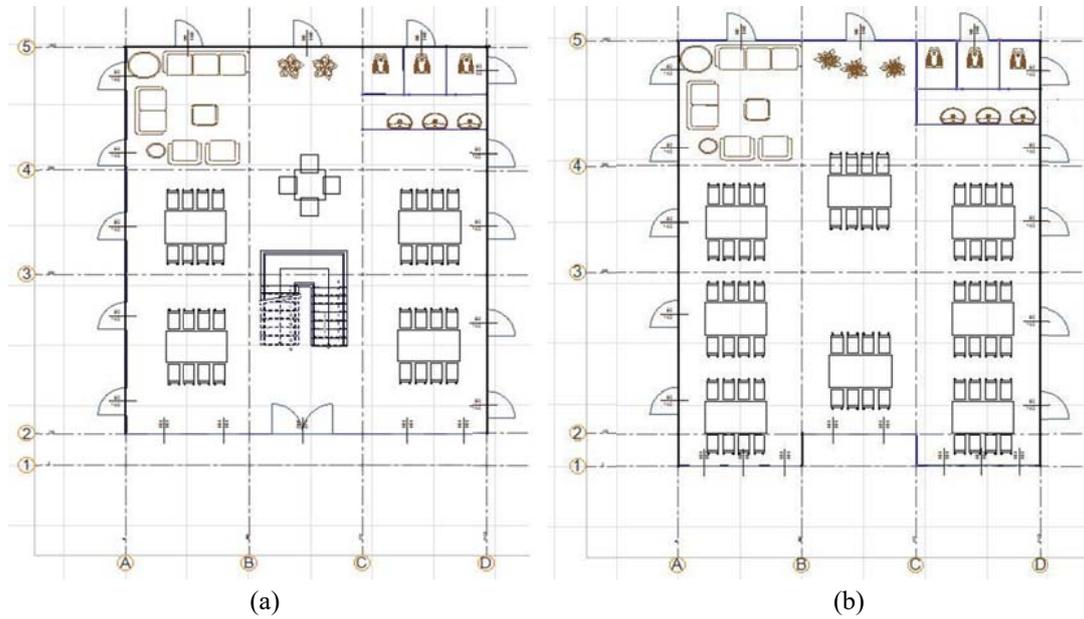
Floor plans of the Restaurant: (a) Ground floor (b) First floor
